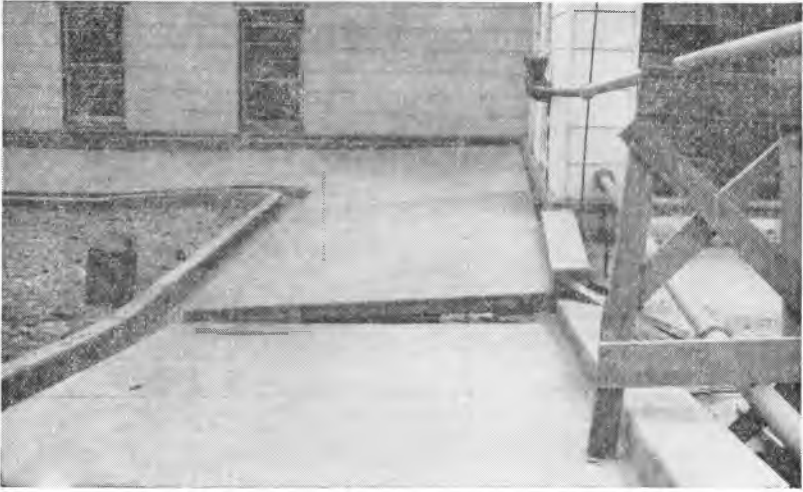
Permafrost Damage. This shows severe damage to a sidewalk due in part to differential settlement of the building caused by thawing subsoils.
